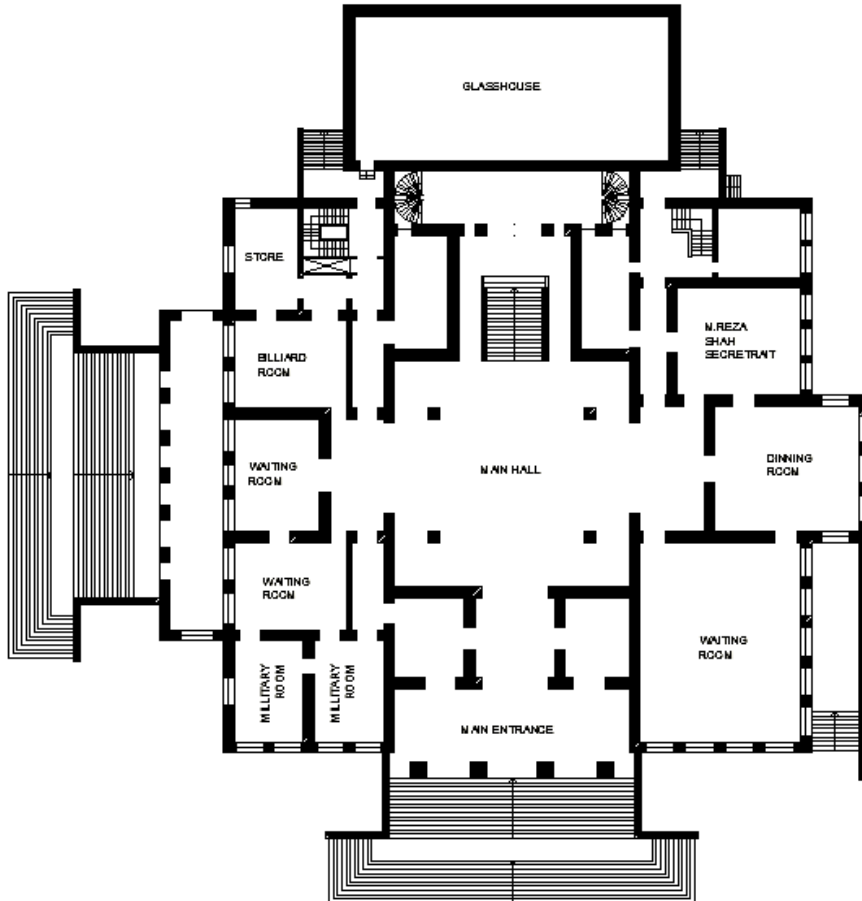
The Ground Floor Plan of the White Palace of Sa'ad Abad.
